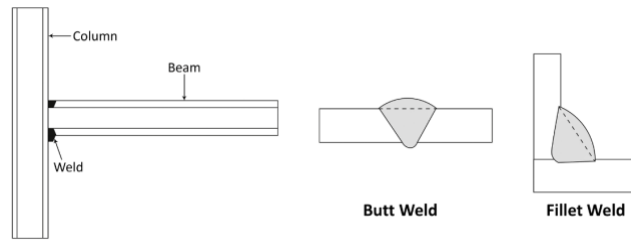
Welded connections used in our steel structure²⁷
